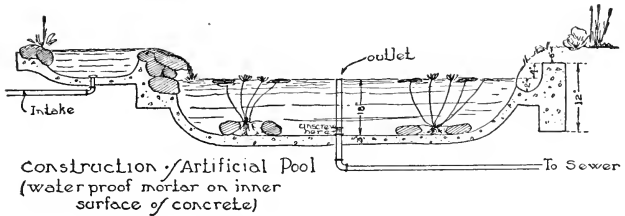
Cross section of an attractively edged pool of concrete with a supplementary, smaller pool and waterfall provided at one end for added effect
